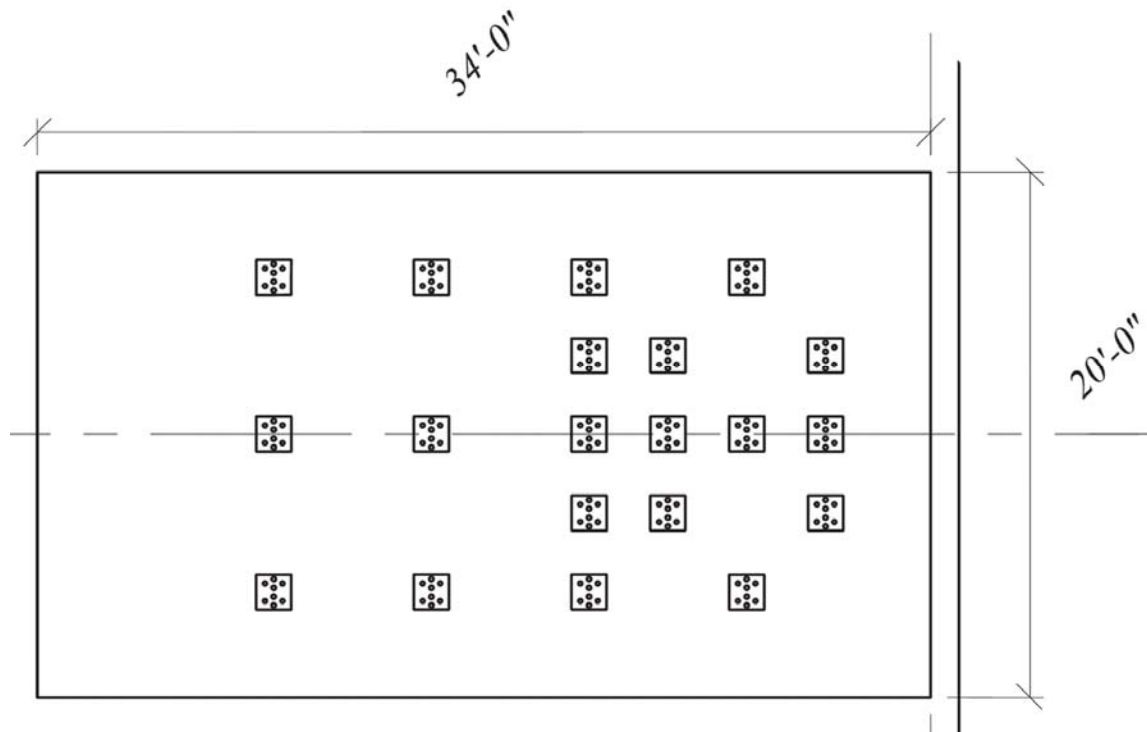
Reinforced concrete foundation and anchors in FDOT pendulum facility (Consolazio et al., 2014)
